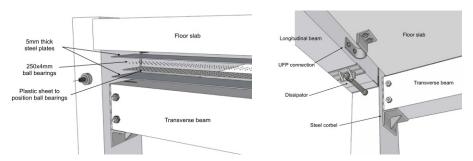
a) Exploded view of ball bearing system (left). b) UFP connection between underside of floor slab and beams (right).
